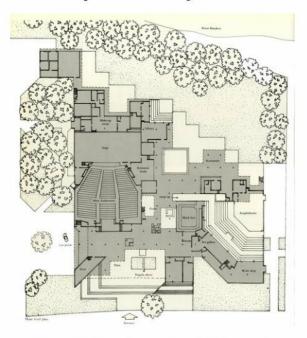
Main floor plan of Kala Academy Photo credit: Aga Khan Trust for Culture
